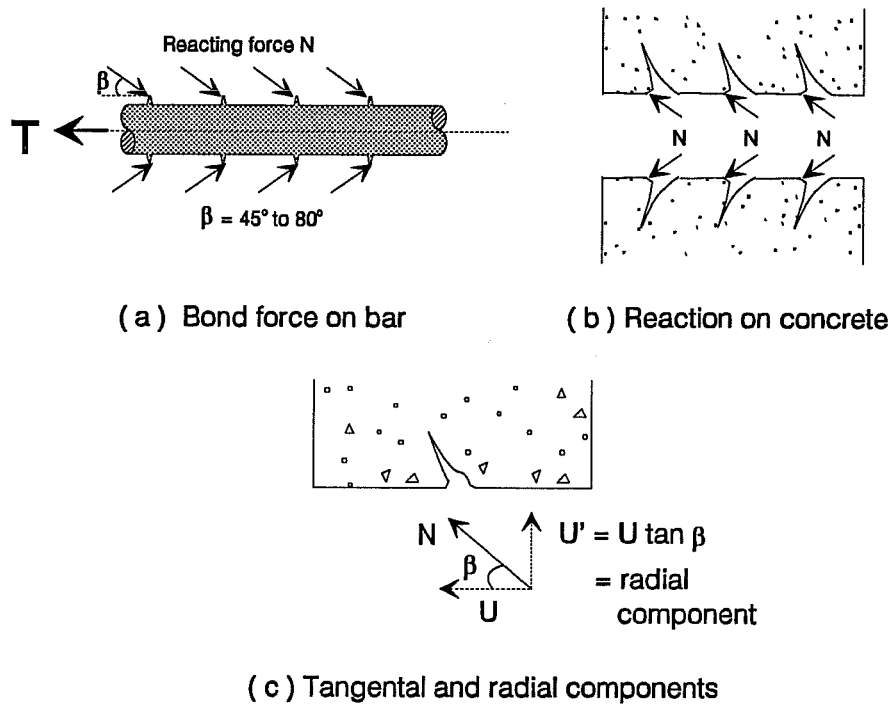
Forces between deformed bar and concrete (Ref. 5)
